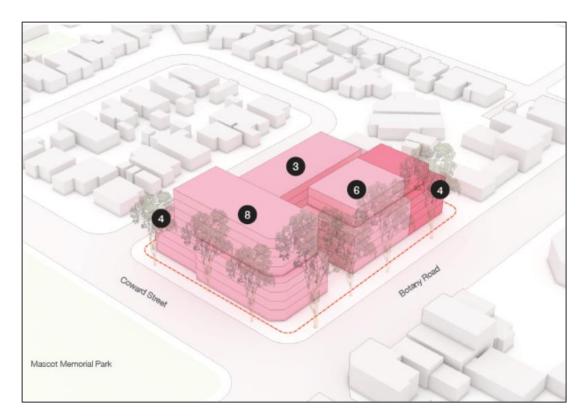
Indicative Concept Scheme (SJB Architects, 2021)
